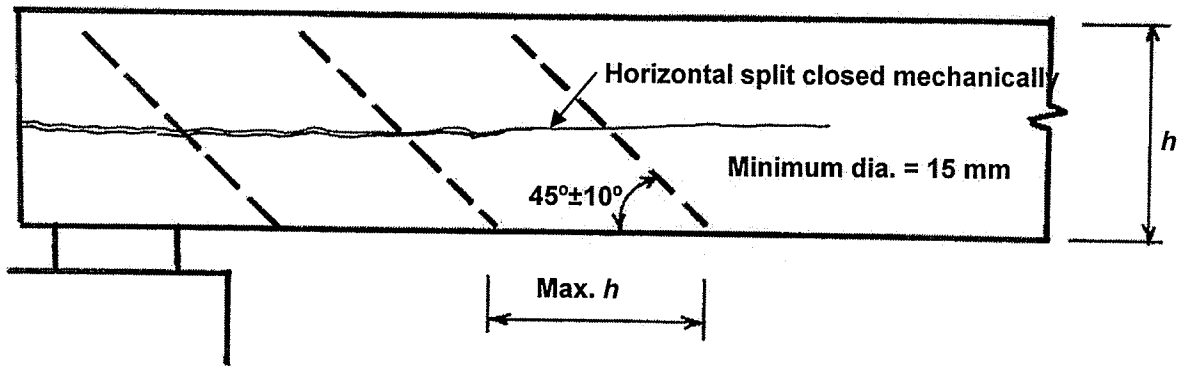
Elevation of timber beam with GFRP bars for shear strengthening
